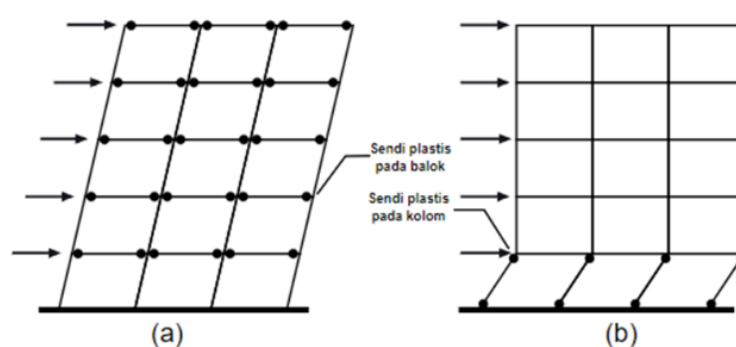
Beam sway mechanism (a), column sway mechanism (b)
